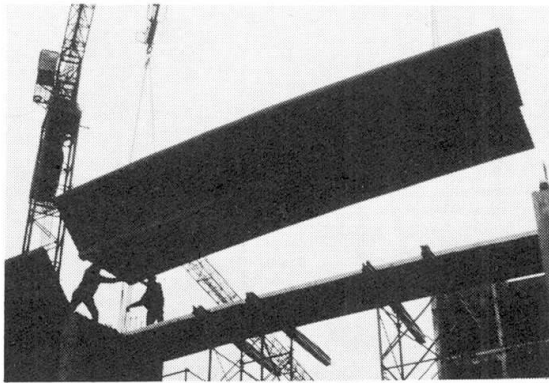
The ring buttress beam was constructed using prefab shell elements also forming the water drainage system.
